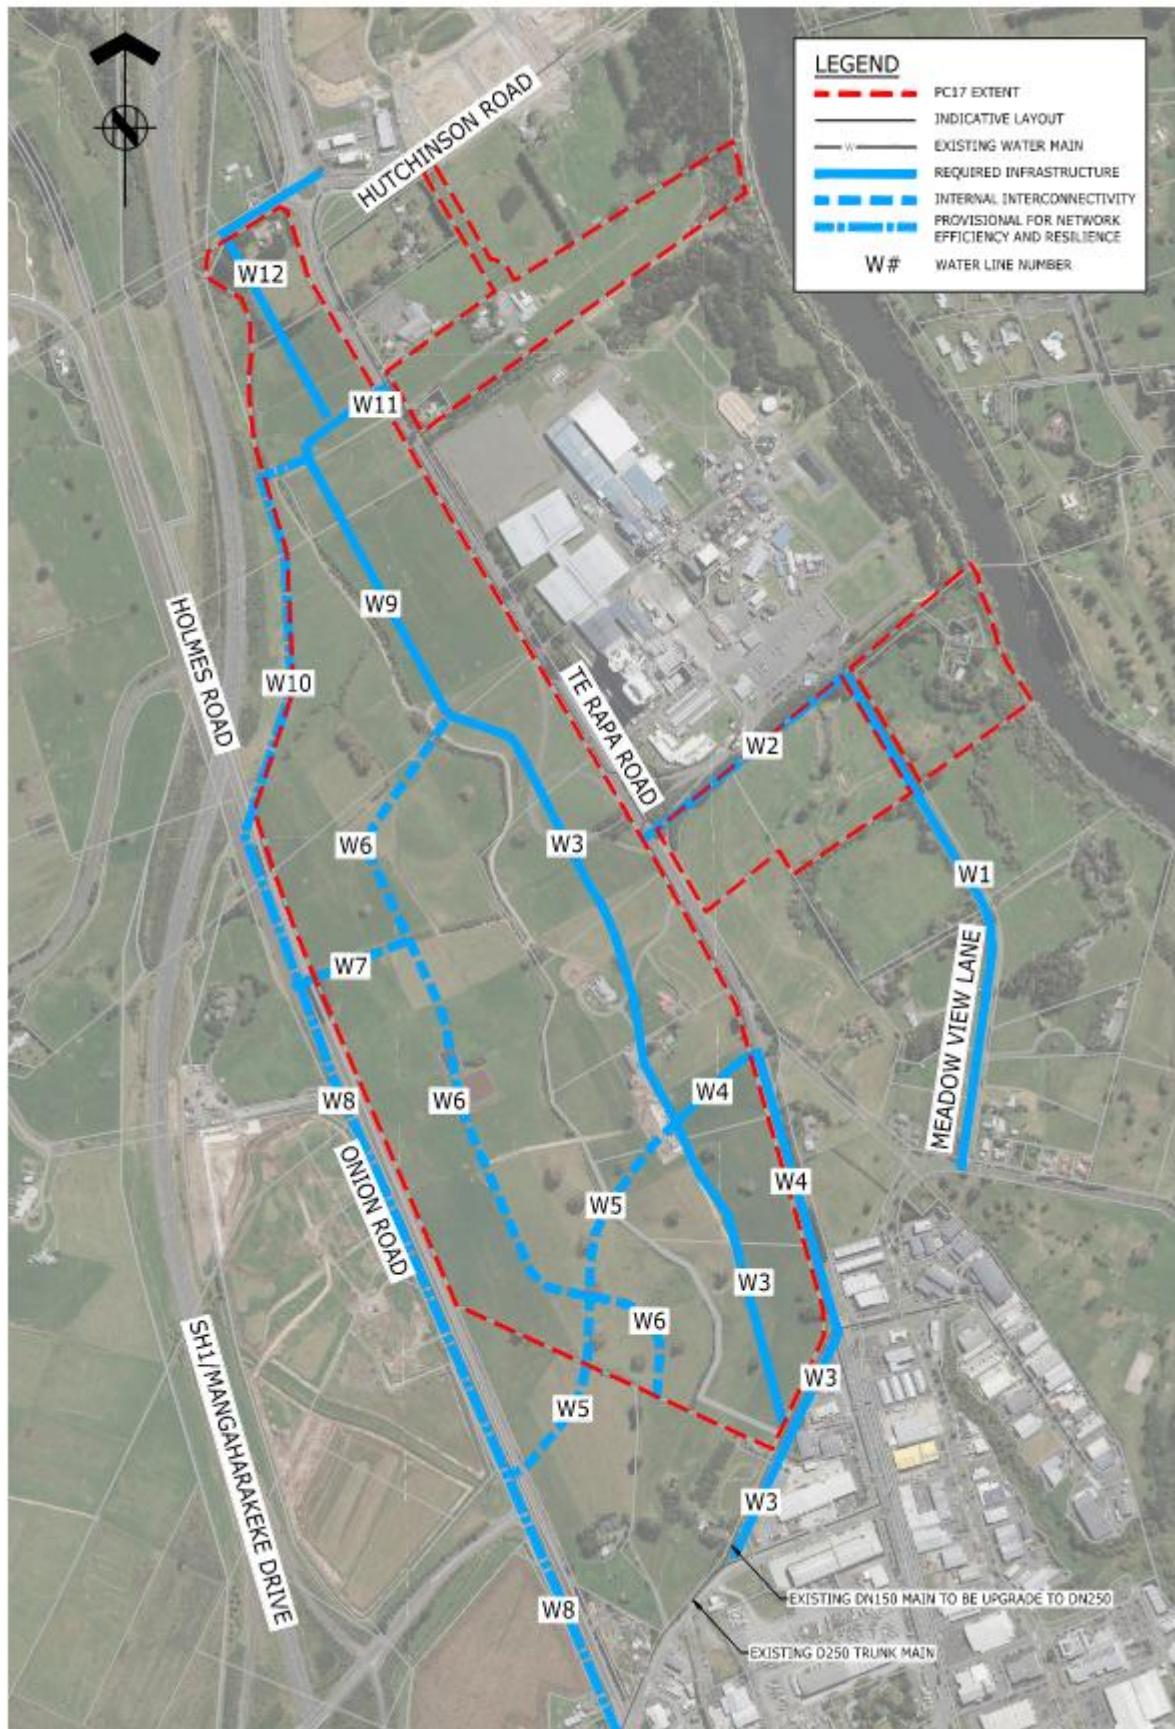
Te Rapa North Servicing Concept Layout Scheme Plan (Water)
